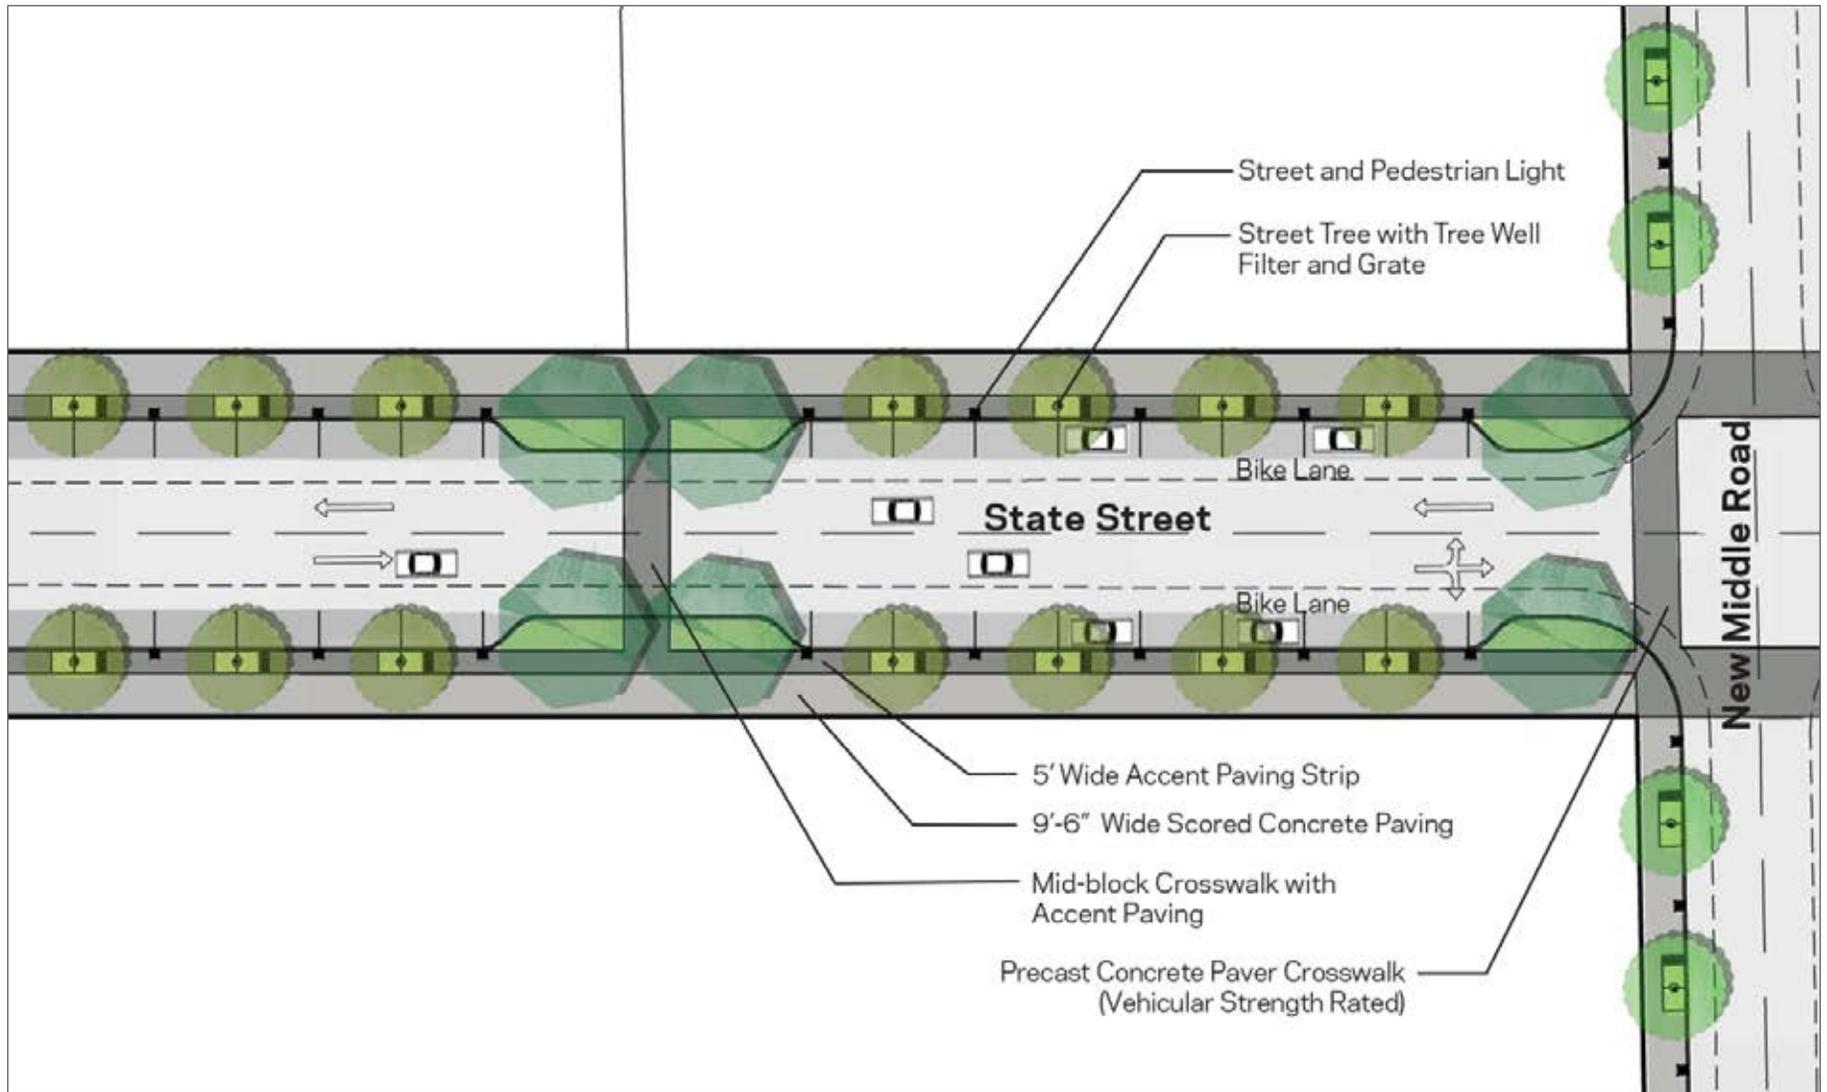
State Street: Capitol Ave. to Beacon Ave. - Street Plan (top)
